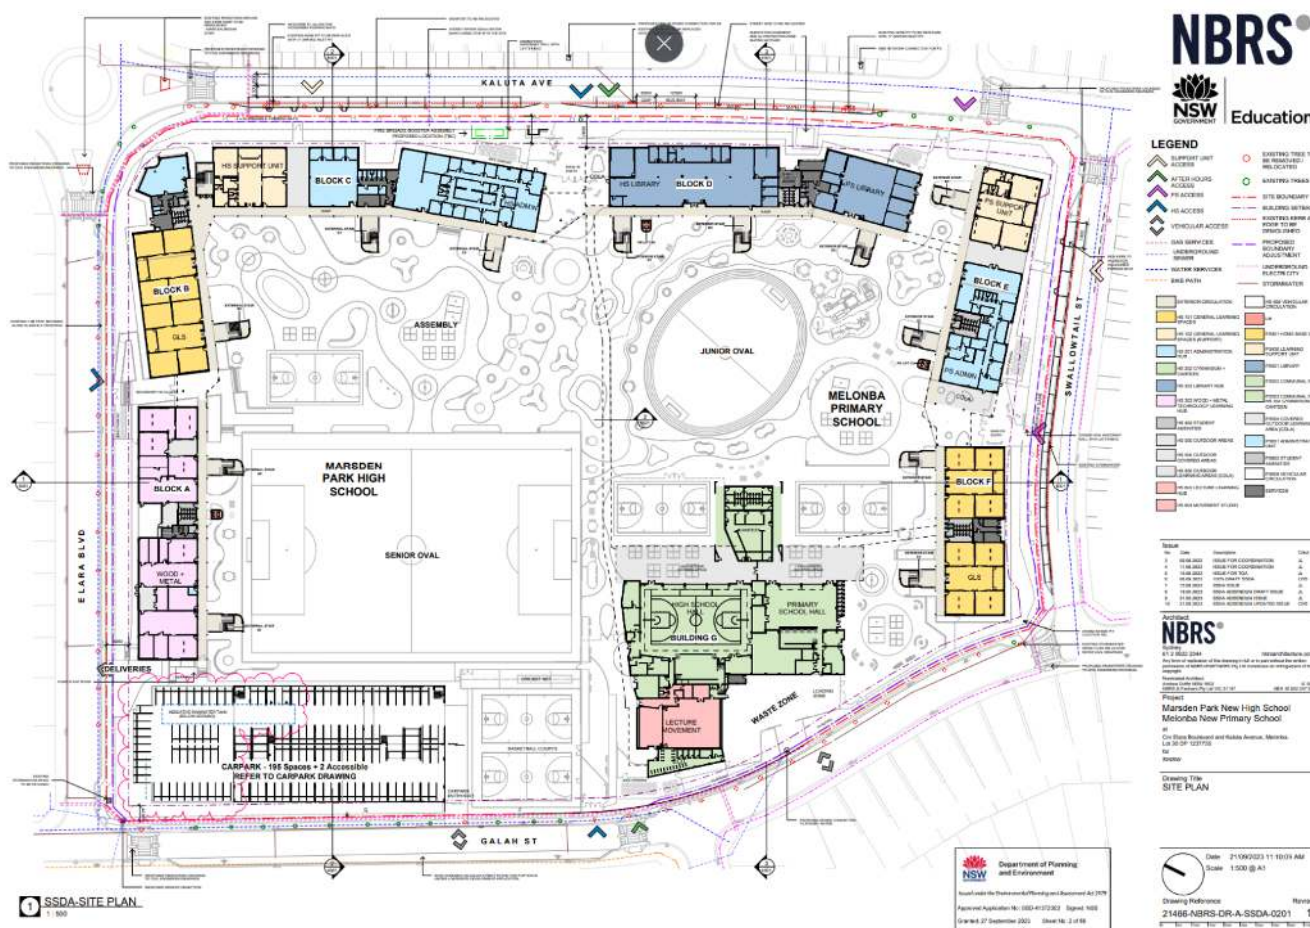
SSDA-Site Plan (Source: DPHI <https://www.planningportal.nsw.gov.au/major-projects/projects/marsden-park-high-school-and-melonba-primary-school>)
